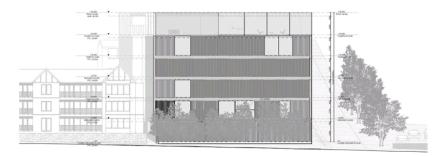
The Sandy Bay Road Elevation of the proposed development, with the adjacent 12 Wilmot Street building to the left (Source: Room11 Architects).
